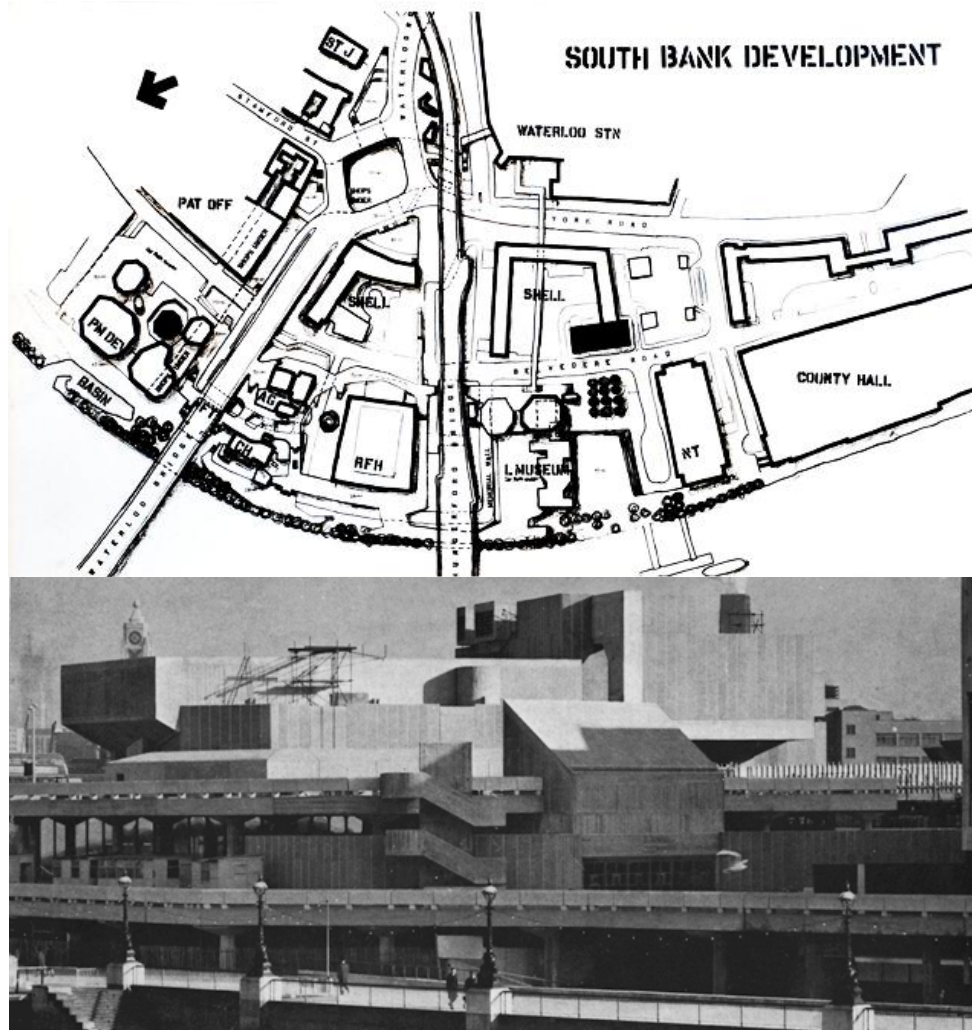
South Bank Development, Collage Ron Herron, Photograph of Completed Building & Queen Elizabeth Hall, LCC Photographic Unit, 1960-1962.
